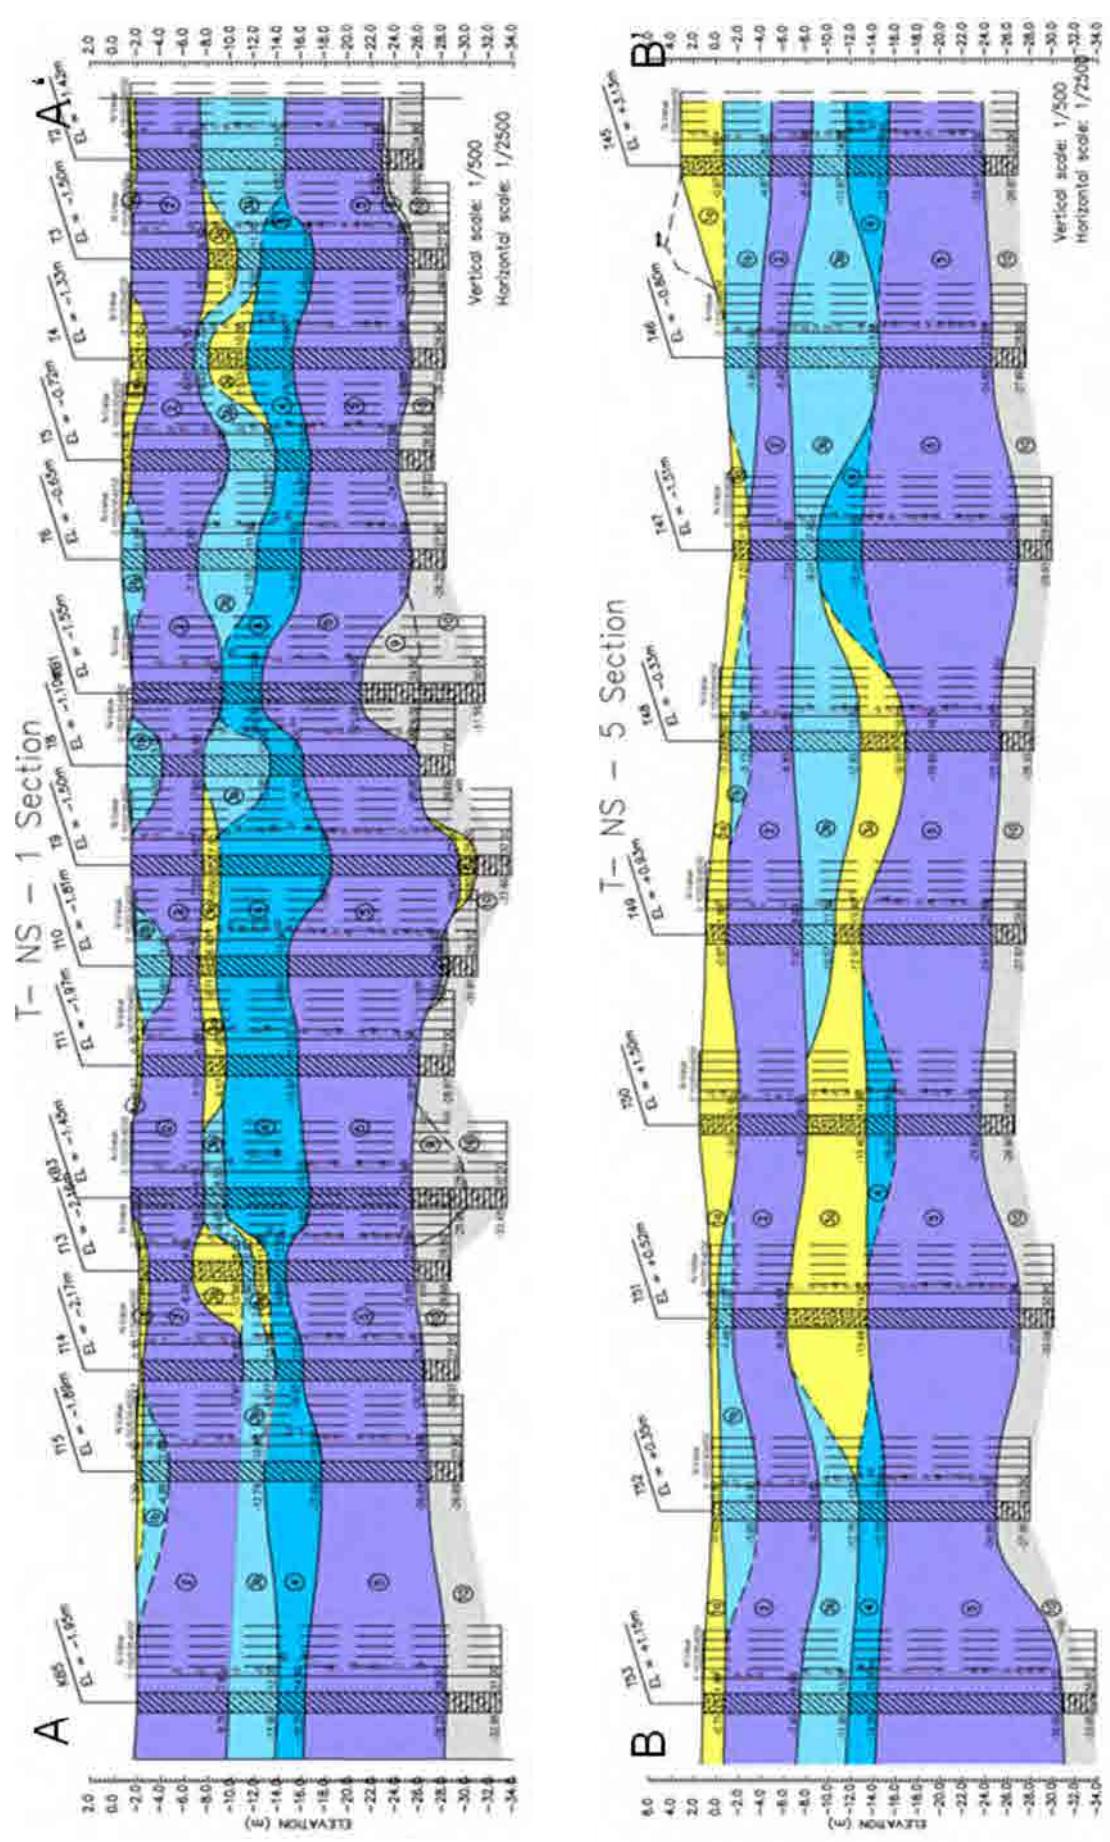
Soil Profiles at Terminal Area and Access Road Area (A-A' and B-B' sections)
